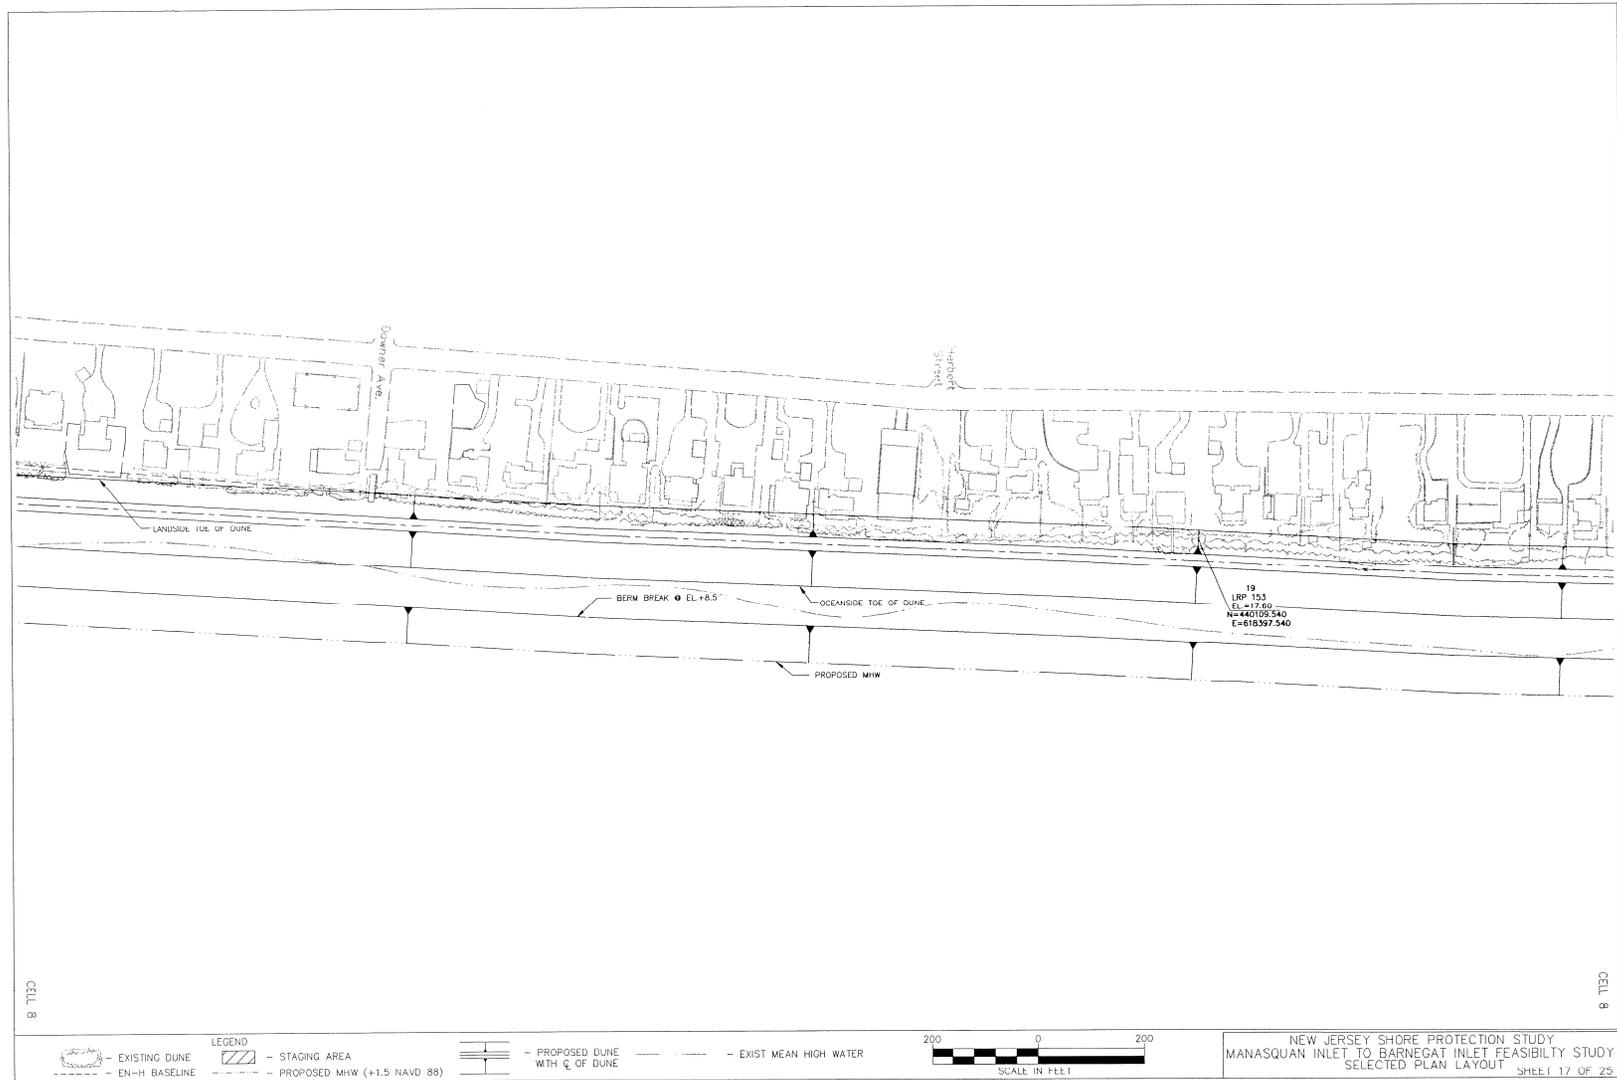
Selected Plan Layout – Mantoloking Borough, South of Downer Avenue to North of Herbert Street
